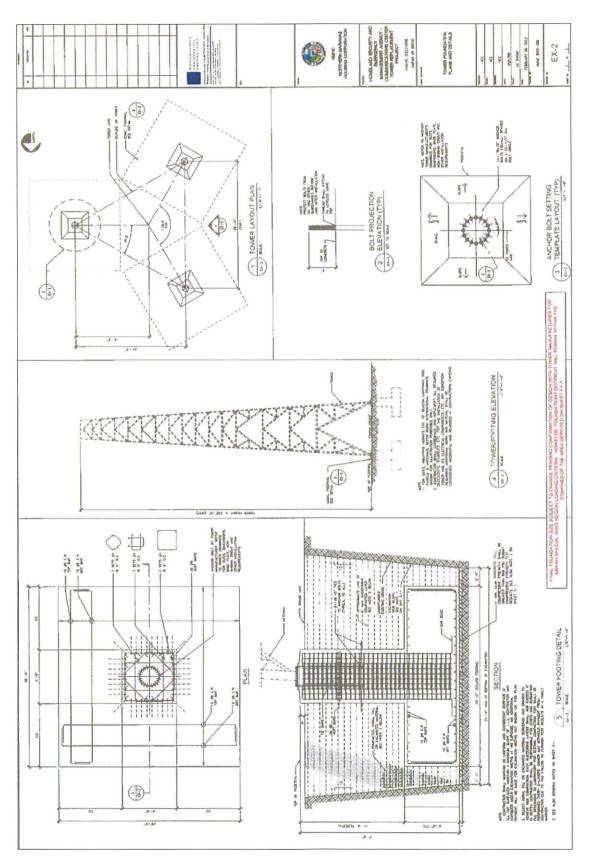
Construction plans for the proposed replacement tower (courtesy of W. Villagomez).
